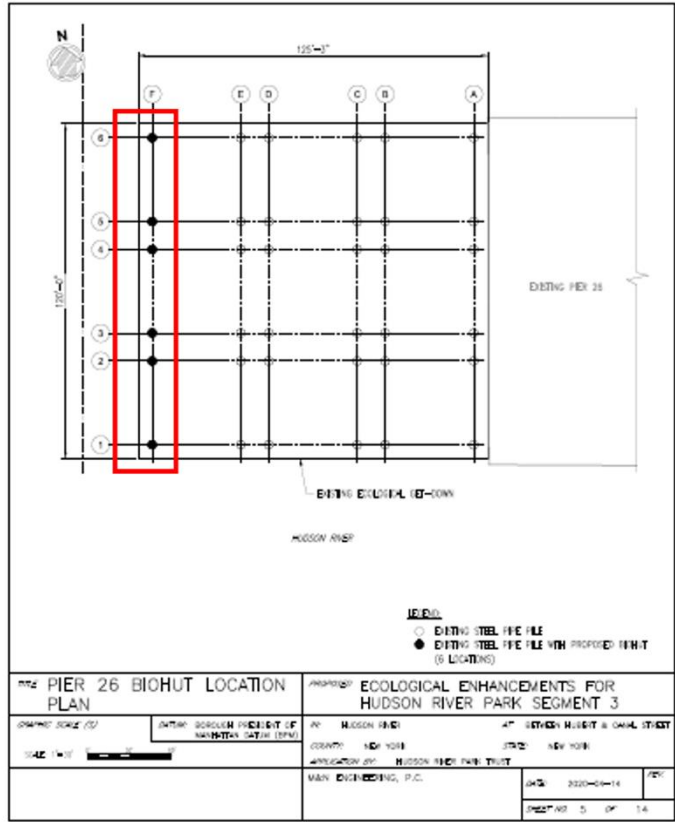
Pier 26 Biohuts plans (via HRPT). Biohuts are wrapped around the pilings enclosed in the red box.
